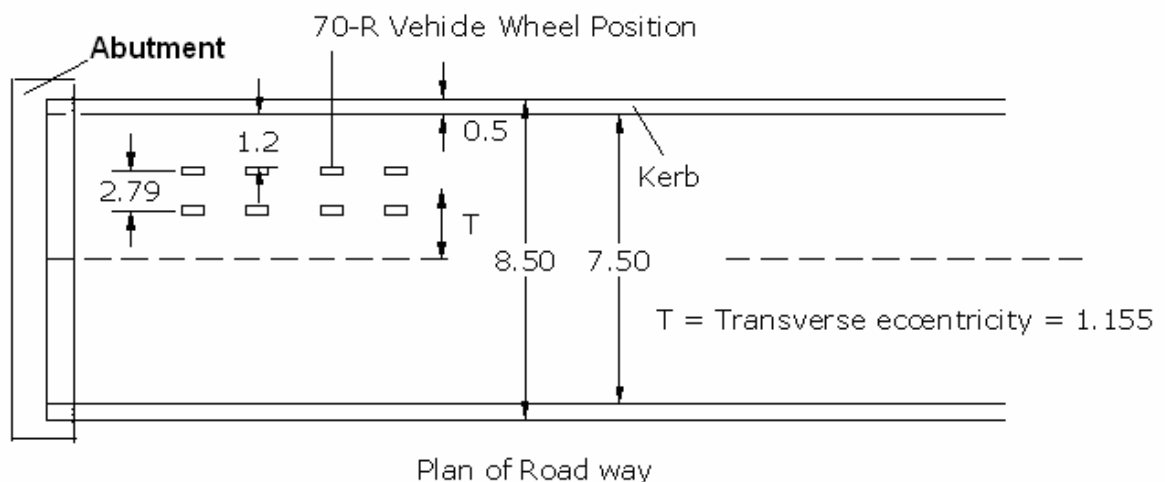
PLAN OF ROAD WAY FOR CURTAILMENT SECTION
